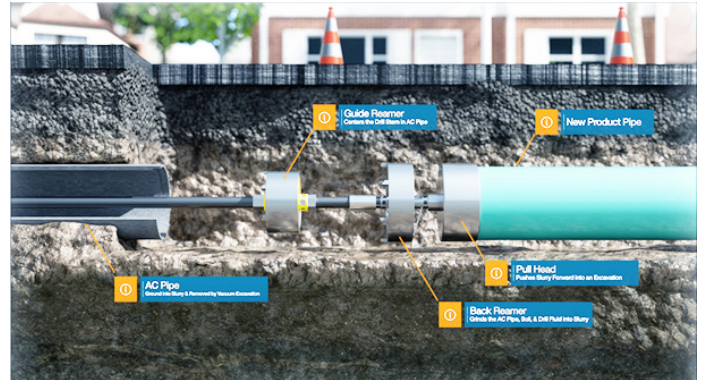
Guide Reamer, Back Reamer (cutting head), and Pull Head components of CTPS installation process
